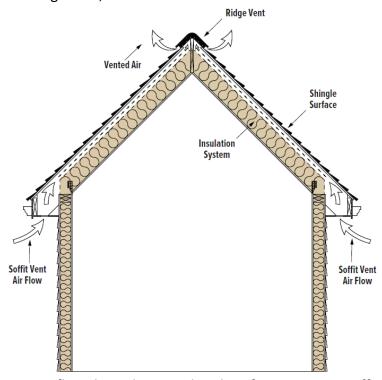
Figure A: Continuous airflow through an insulated roof system using soffit and ridge vents
